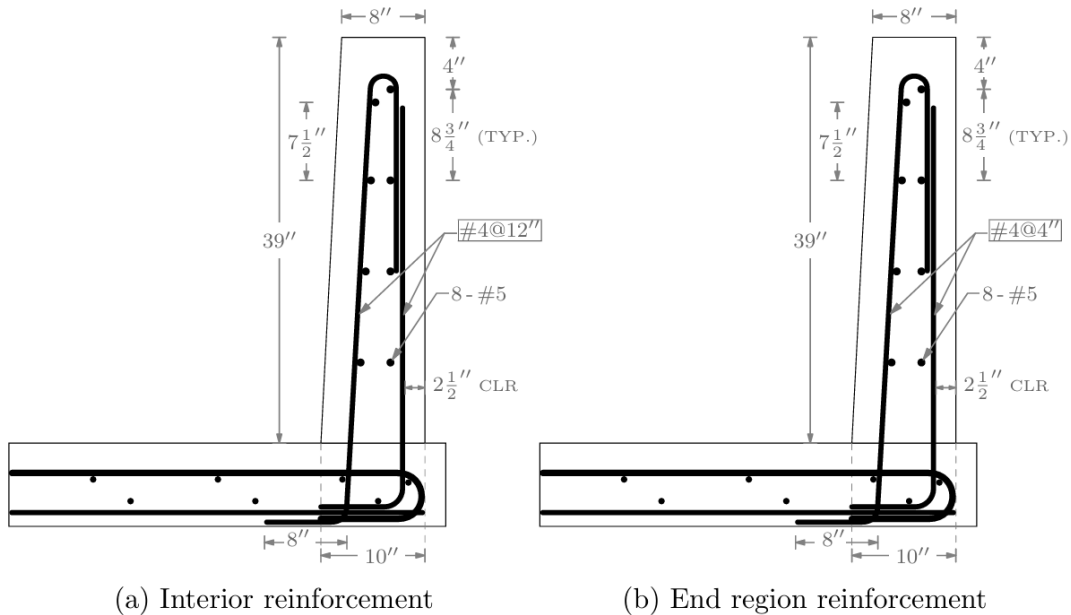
Cross sections of the TL-4 single-slope barrier [33].
